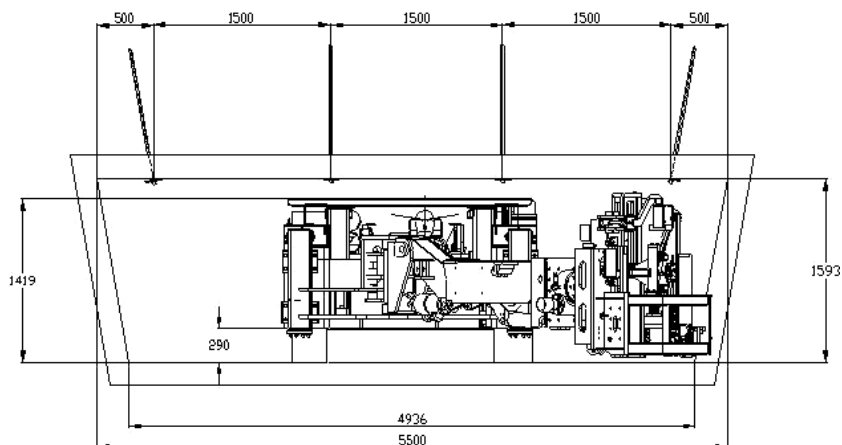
Roof bolting utilising Roof Master 1.4 Automatic
